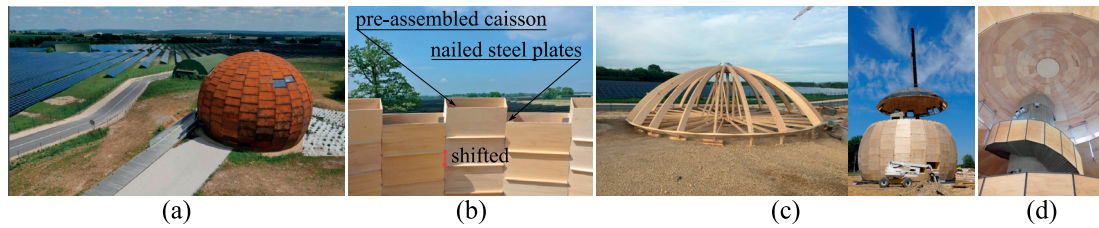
2015 - The Solar Energy House [A. CARTIGNIES, architect] : (a) Site layout, (b) 25mm-thick birch plywood caisson arrangement, (c) Glulam framed top dome, (d) concrete core and internal finishing.
